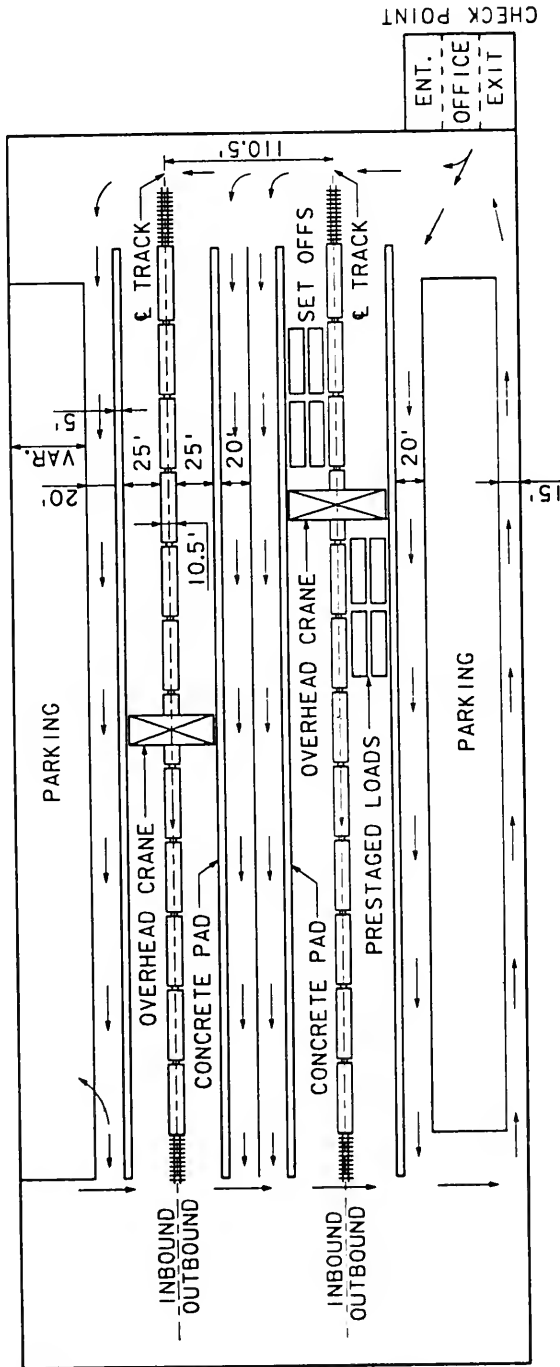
Long Span Crane, Single Track With Double Stack Cars
